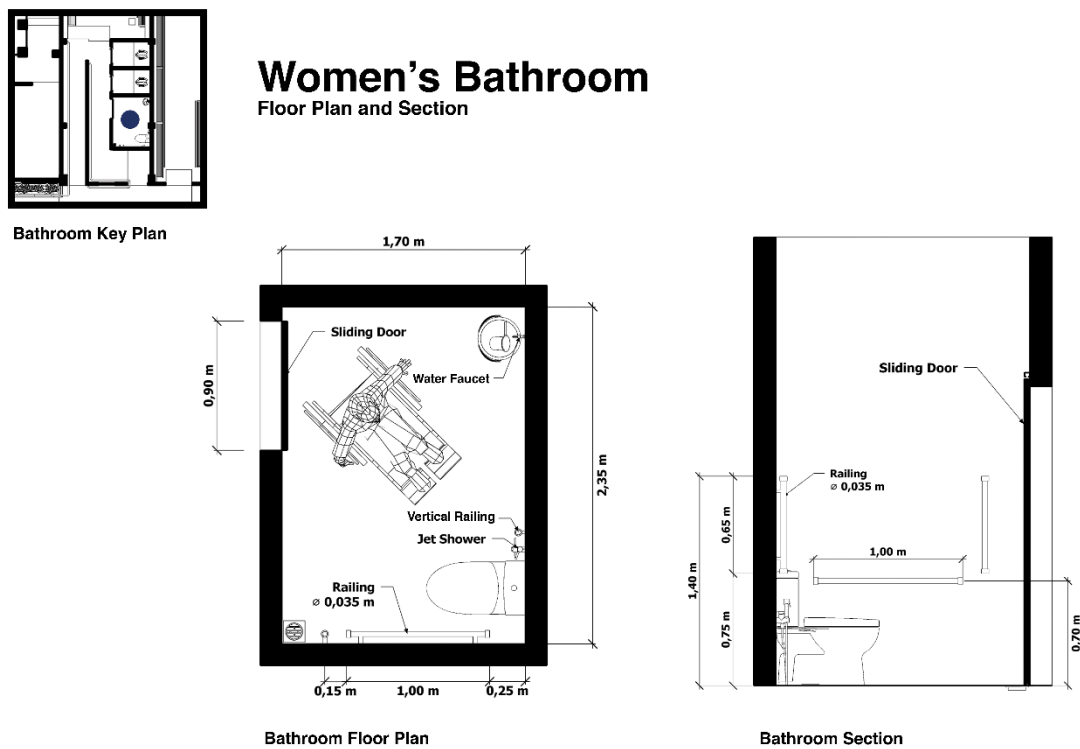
Floor Plan and Detail of Bathroom for Wheelchair Maneuver
